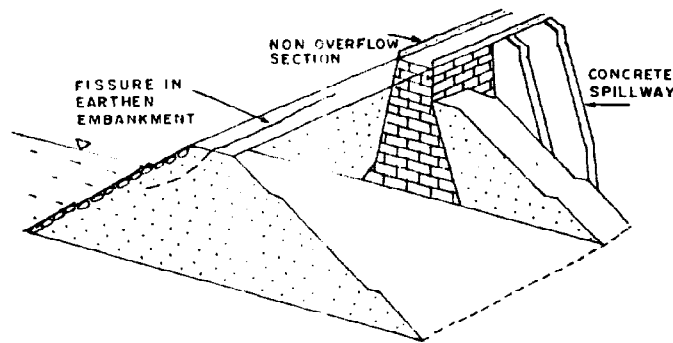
Longitudinal crack in earthen embankment of Makni Dam and slight separation of earthen-masonry section
